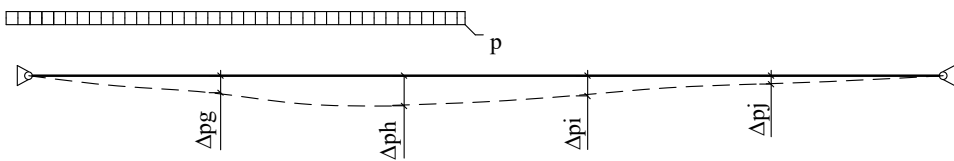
Deformed beam deflections under asymmetrical loading (made by the author)
